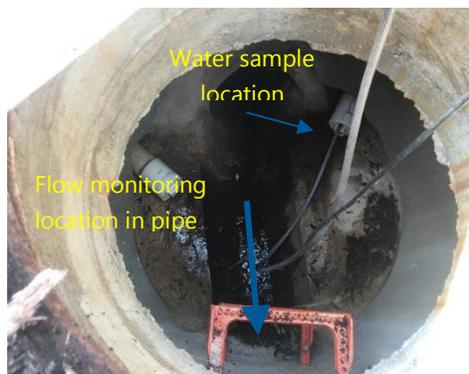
Outlet Configuration, Sampling and Flow Monitoring Locations of the Woodlynn Avenue Swale-Type Ferric Oxide-Sand Filter
